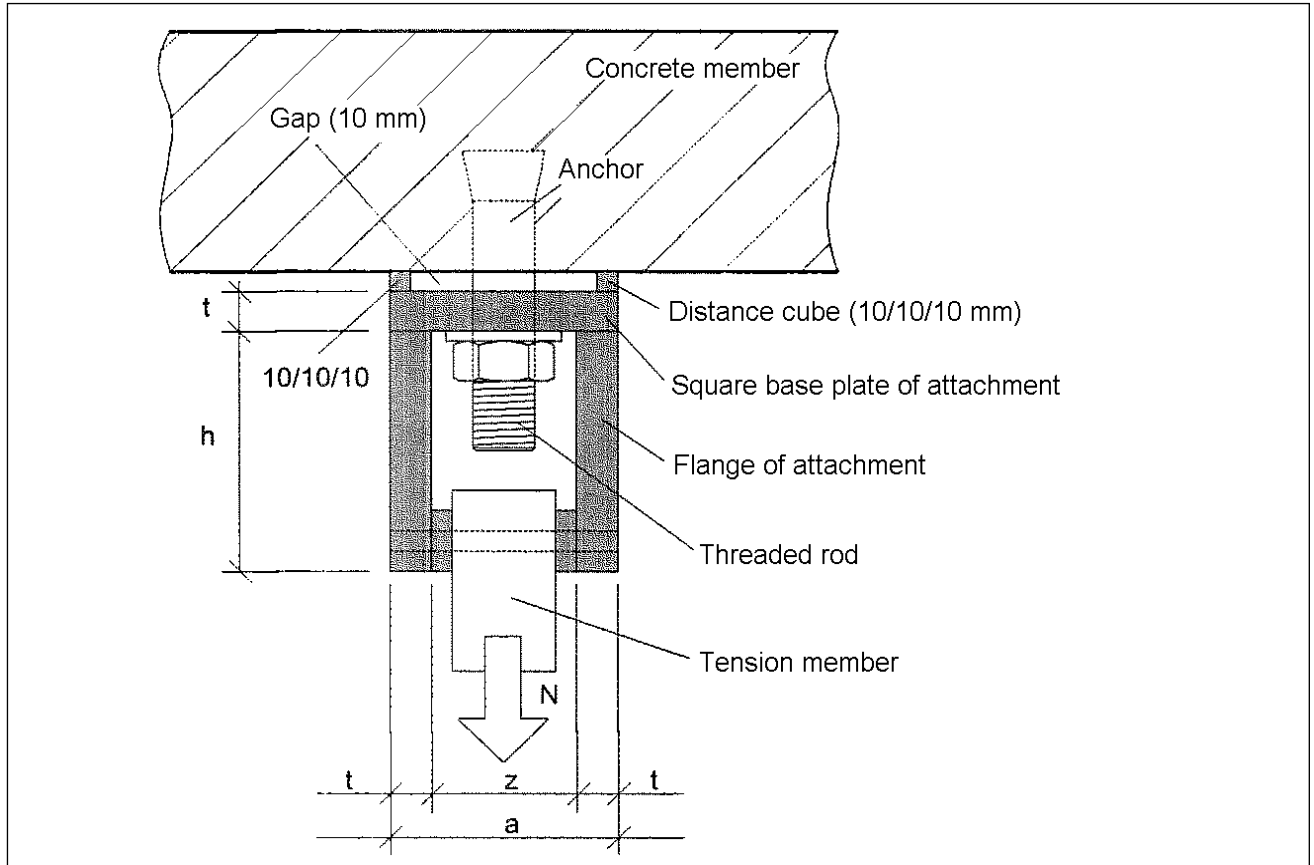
Test setup for the determination of the steel failure under fire exposure
